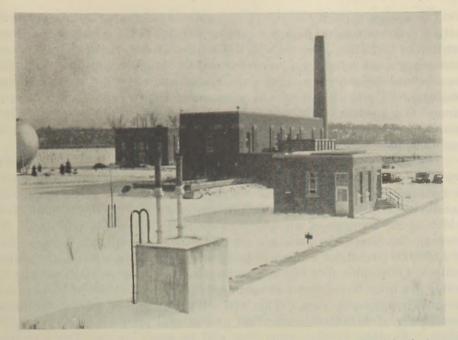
Springfield, Mass. sewage treatment plant. Gas Building in right foreground. Sludge Disposal Building, with elutriation tanks, in center. Administration Building in background.
